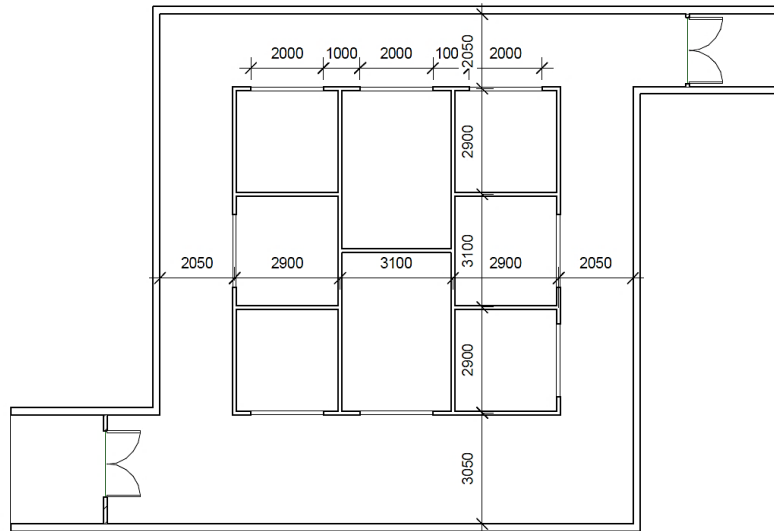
Architectural floor plan for the first block. Scale 1:200.
